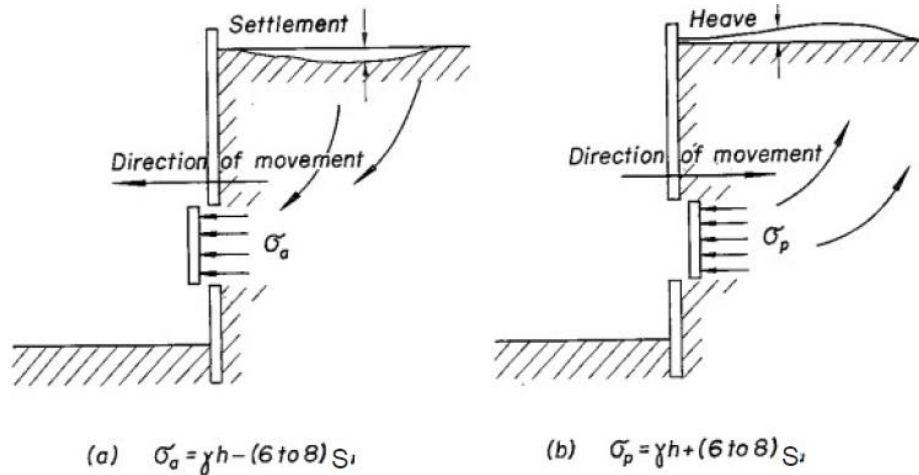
Vertical wall stability model of Broms and Bennermark (1967)
